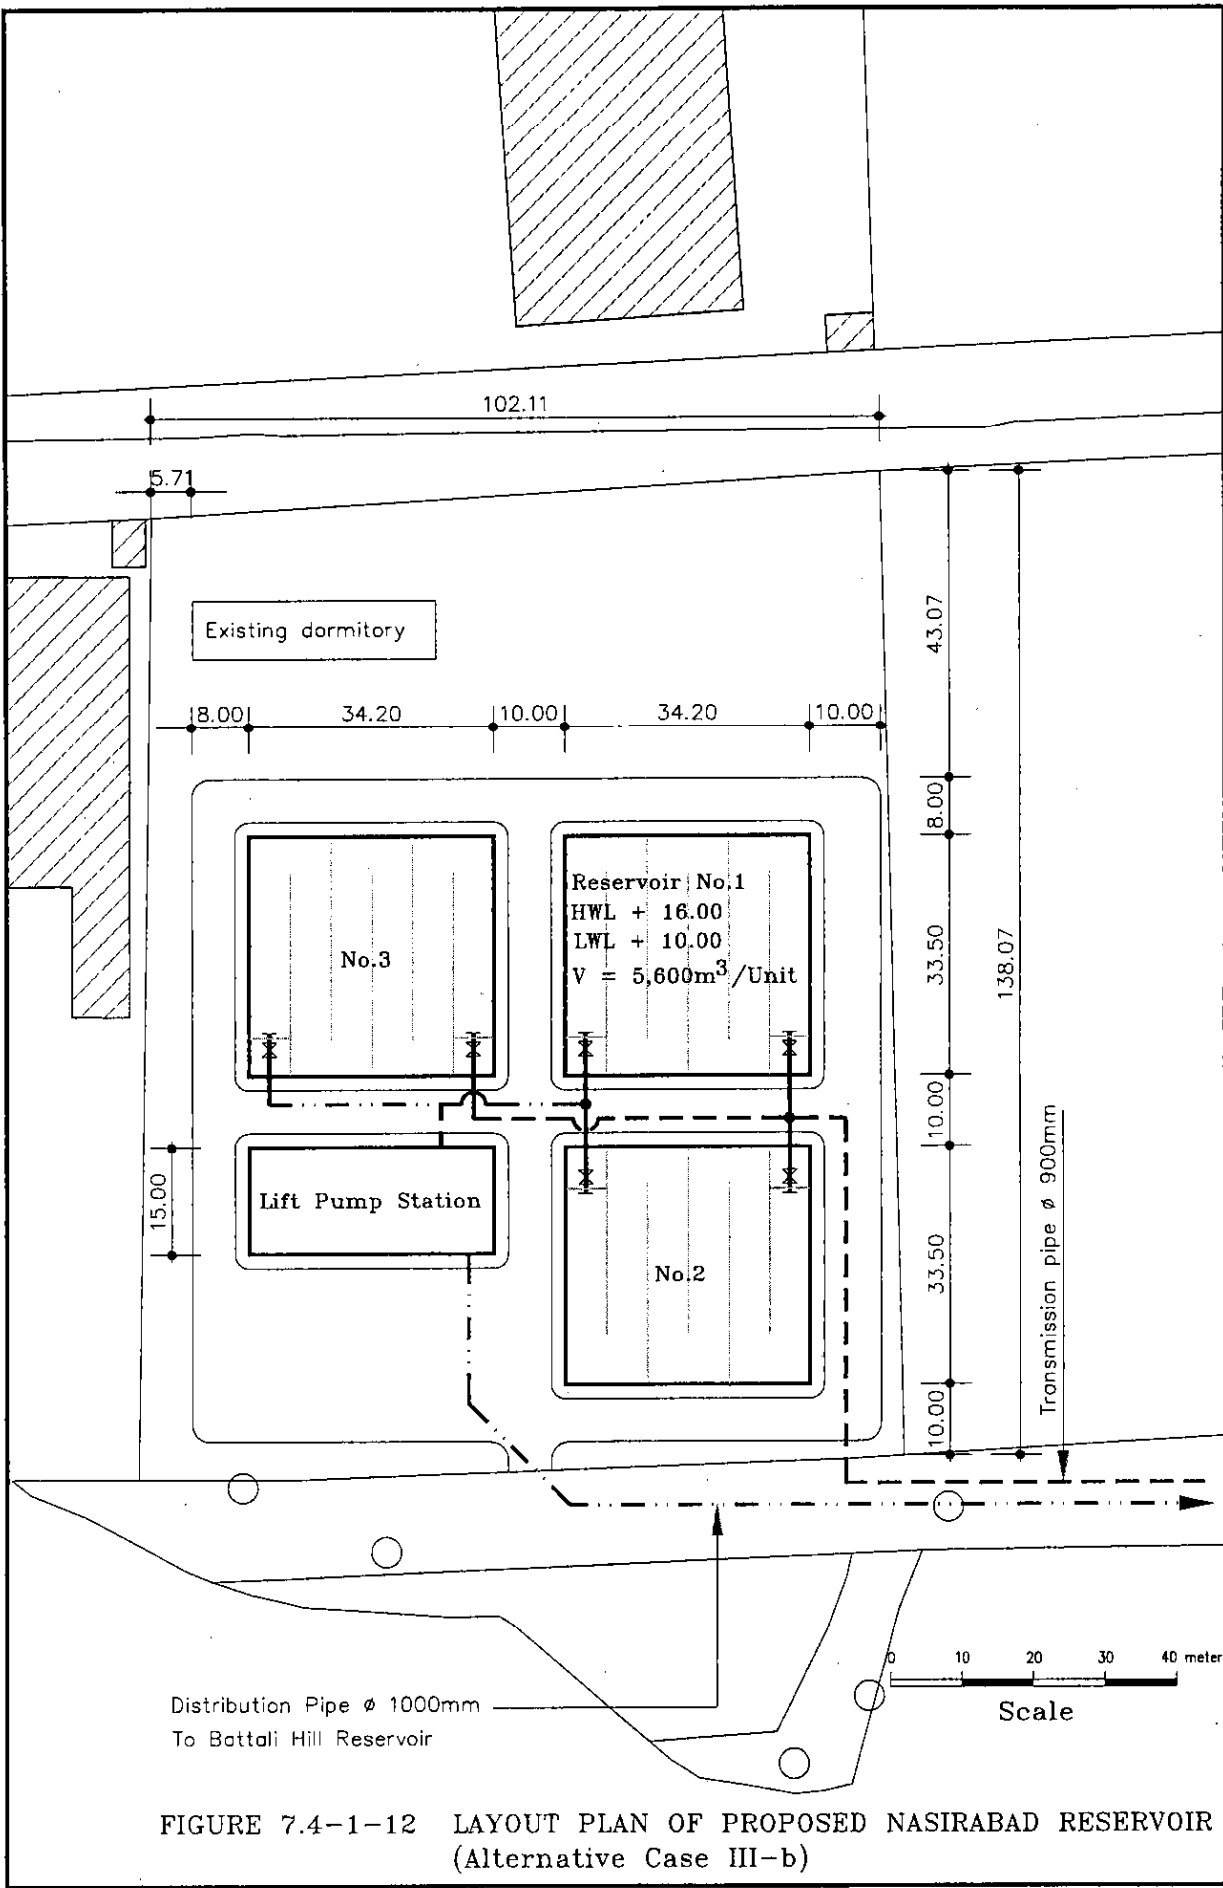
LAYOUT PLAN OF PROPOSED NASIRABAD RESERVOIR (Alternative Case III-b)
